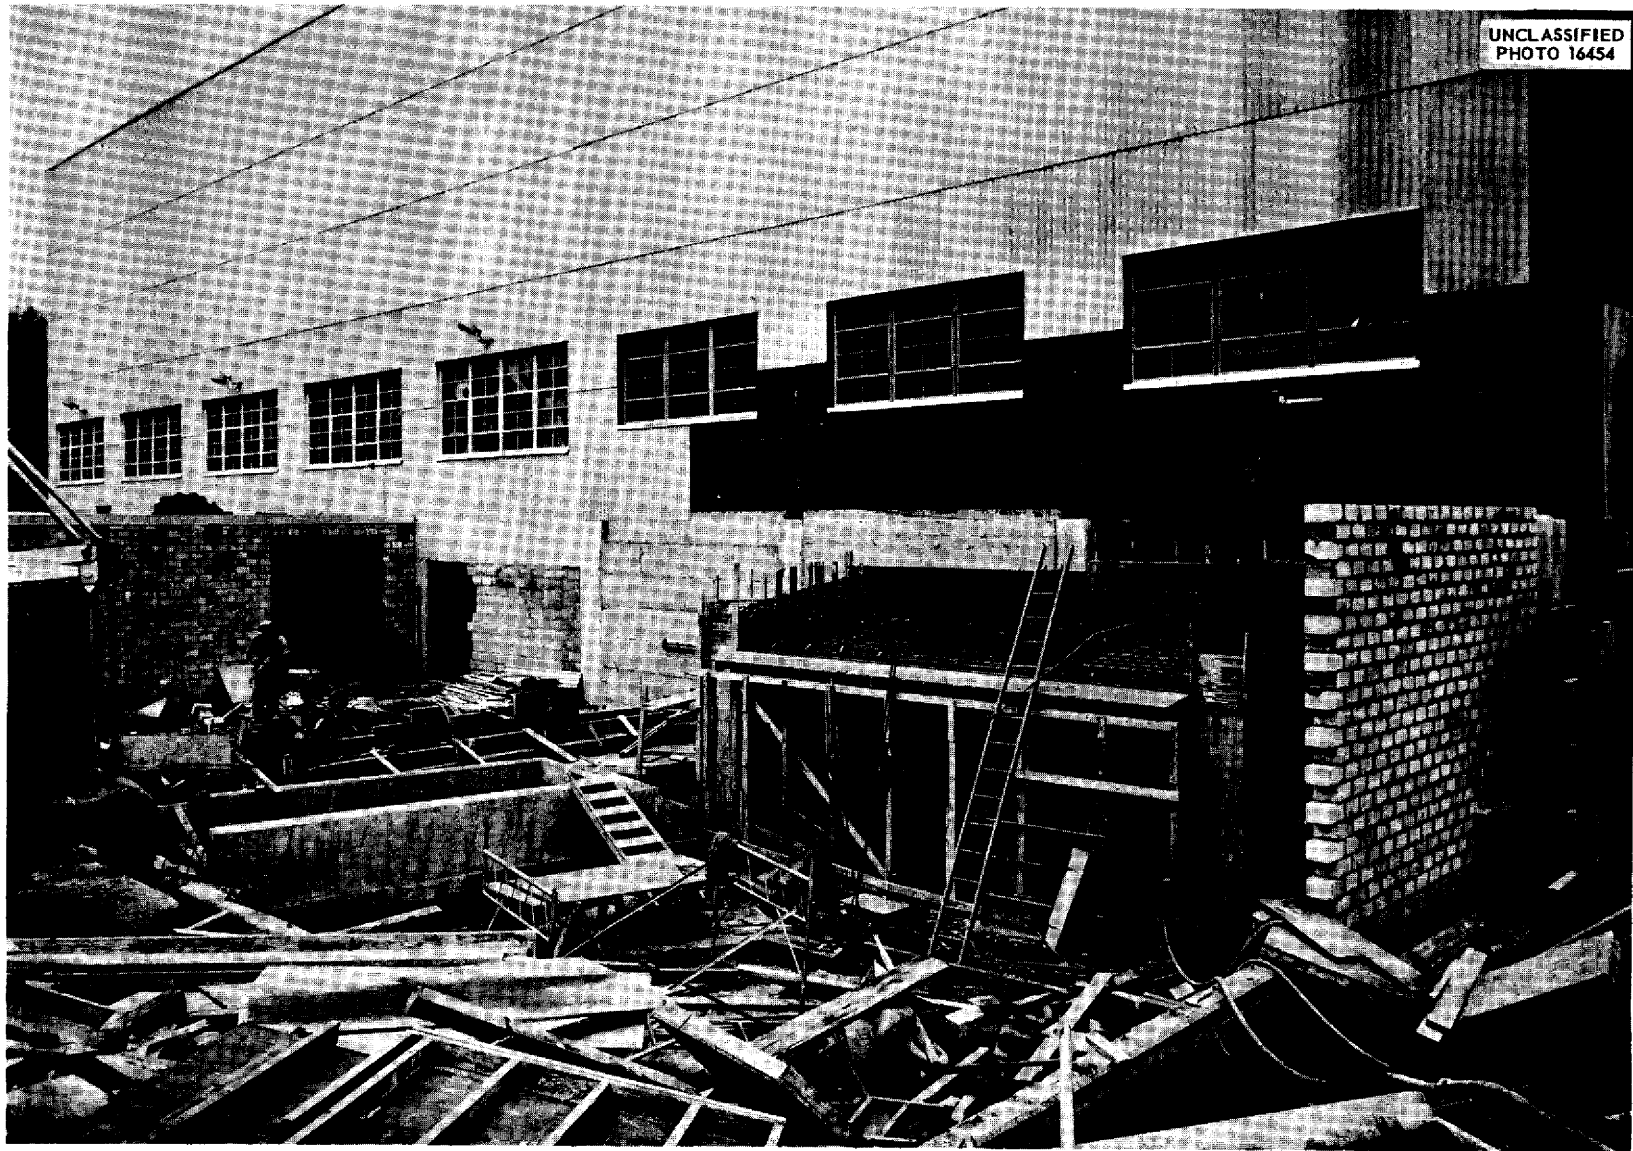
Interior of Blower House Prior to Erection of Exterior Walls. Photograph taken Feb. 10, 1956.
